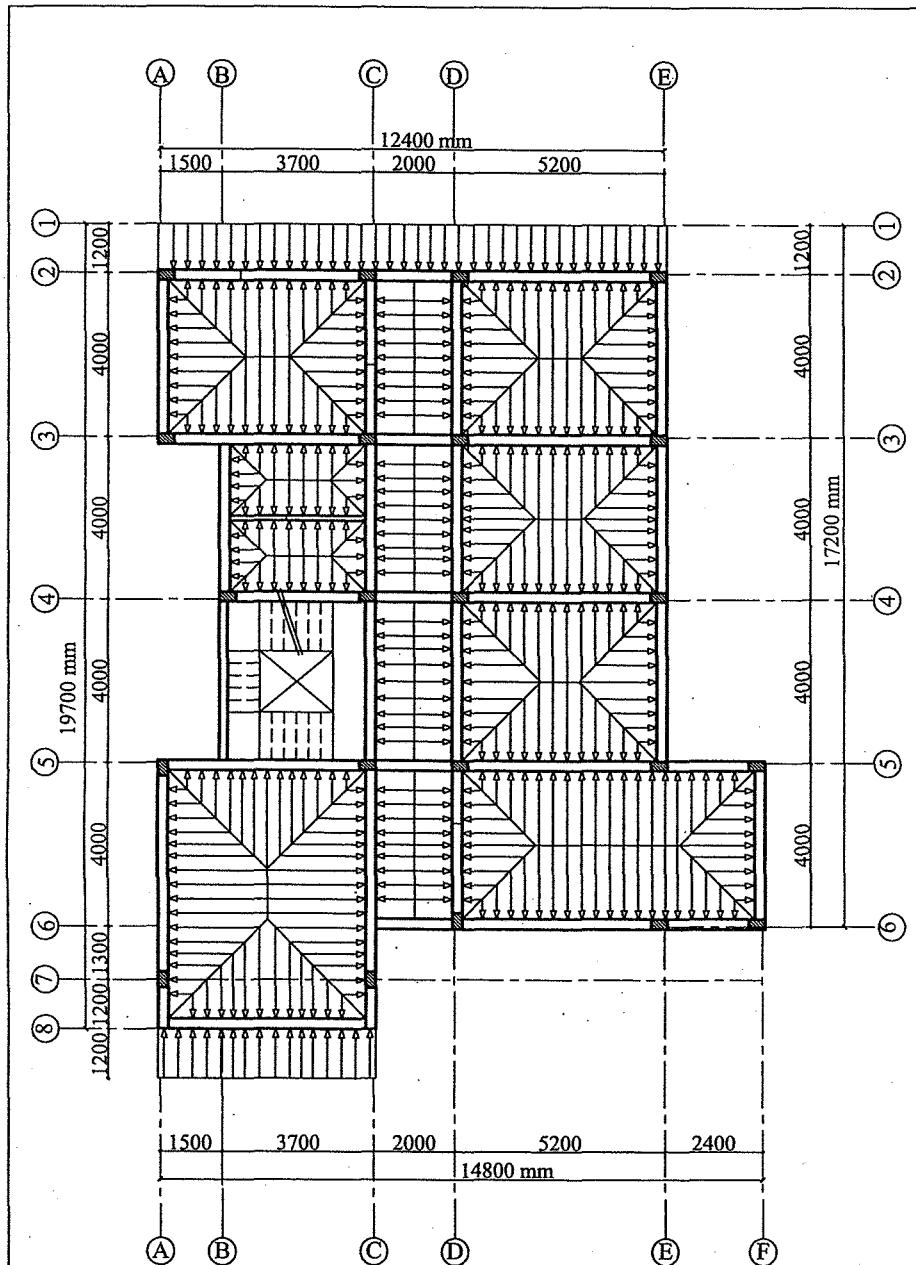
Load distribution from the slab to the surrounding beams
